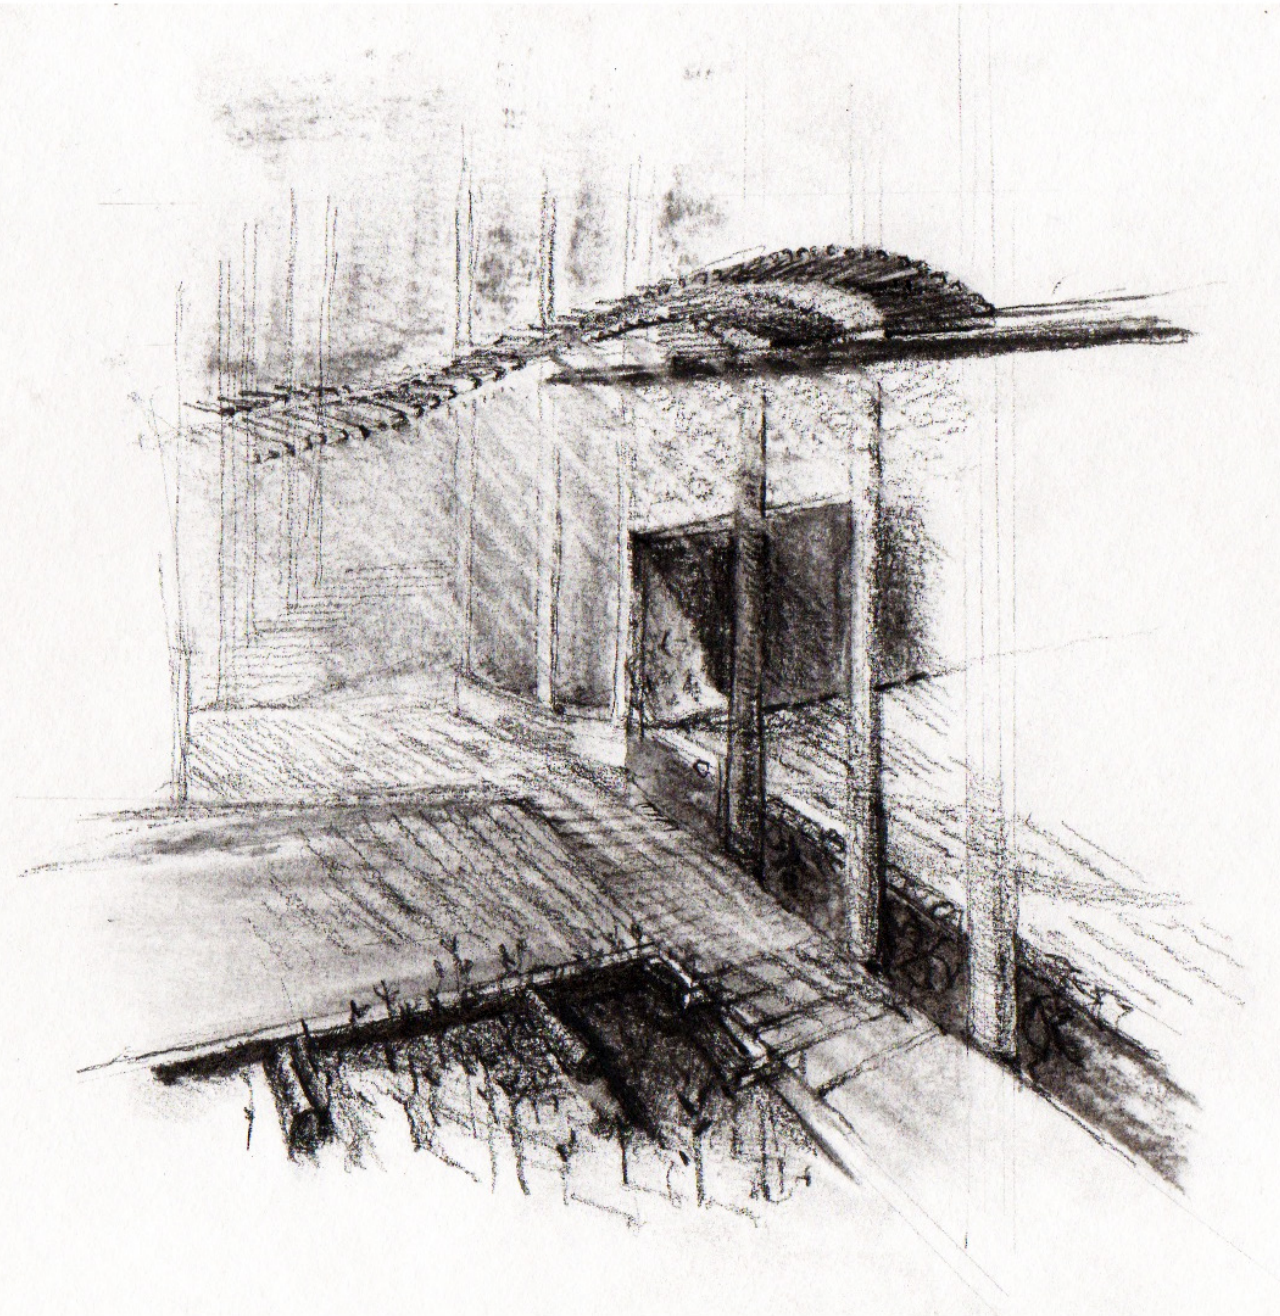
FIRST PLAN DEVELOPMENT (AUTHOR, 2023)
